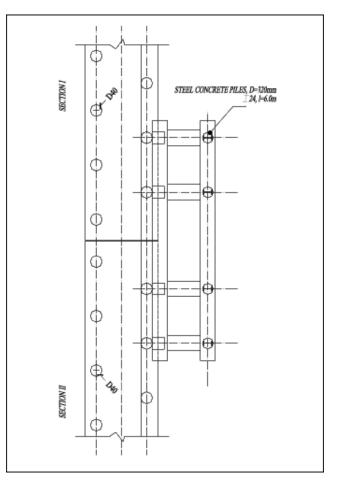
Plan of the most vulnerable zone of existing pile wall and additional strengthening with steel concrete support pile structure
